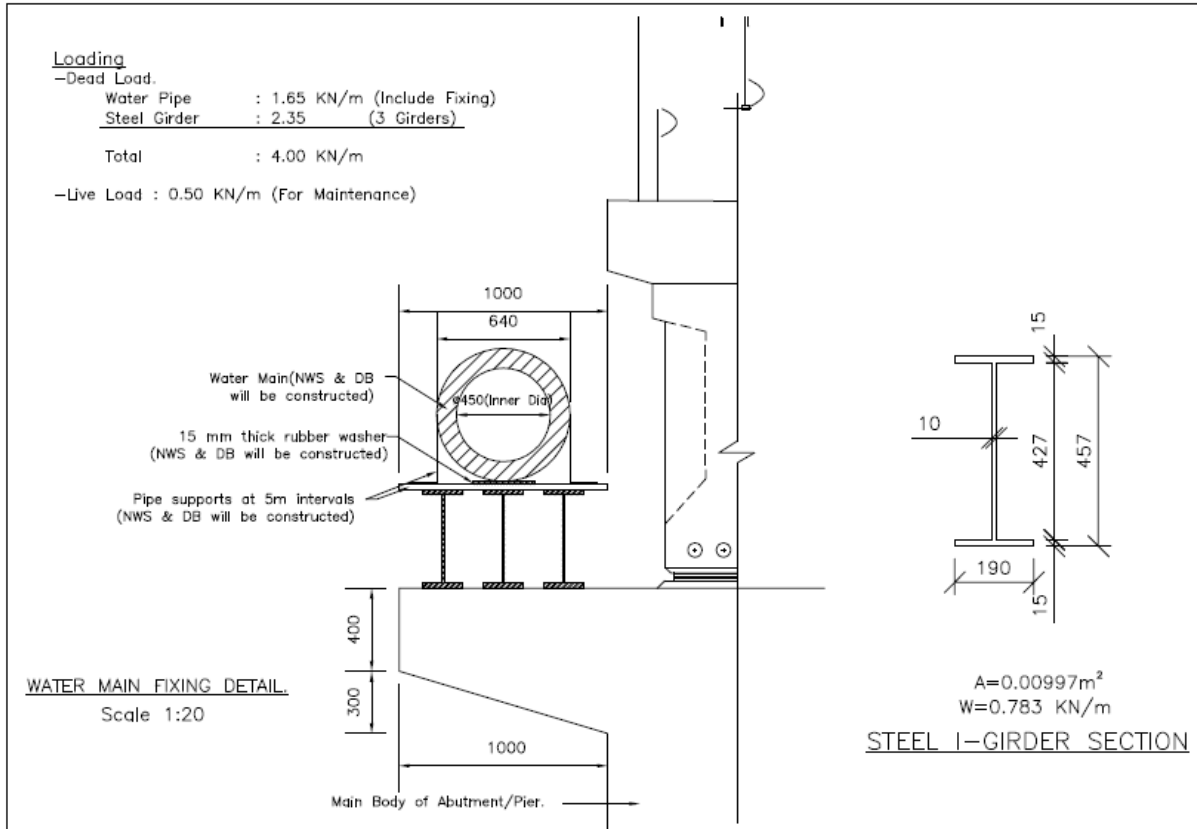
Water-Pipe Fixing Details (For Large Pipe)
